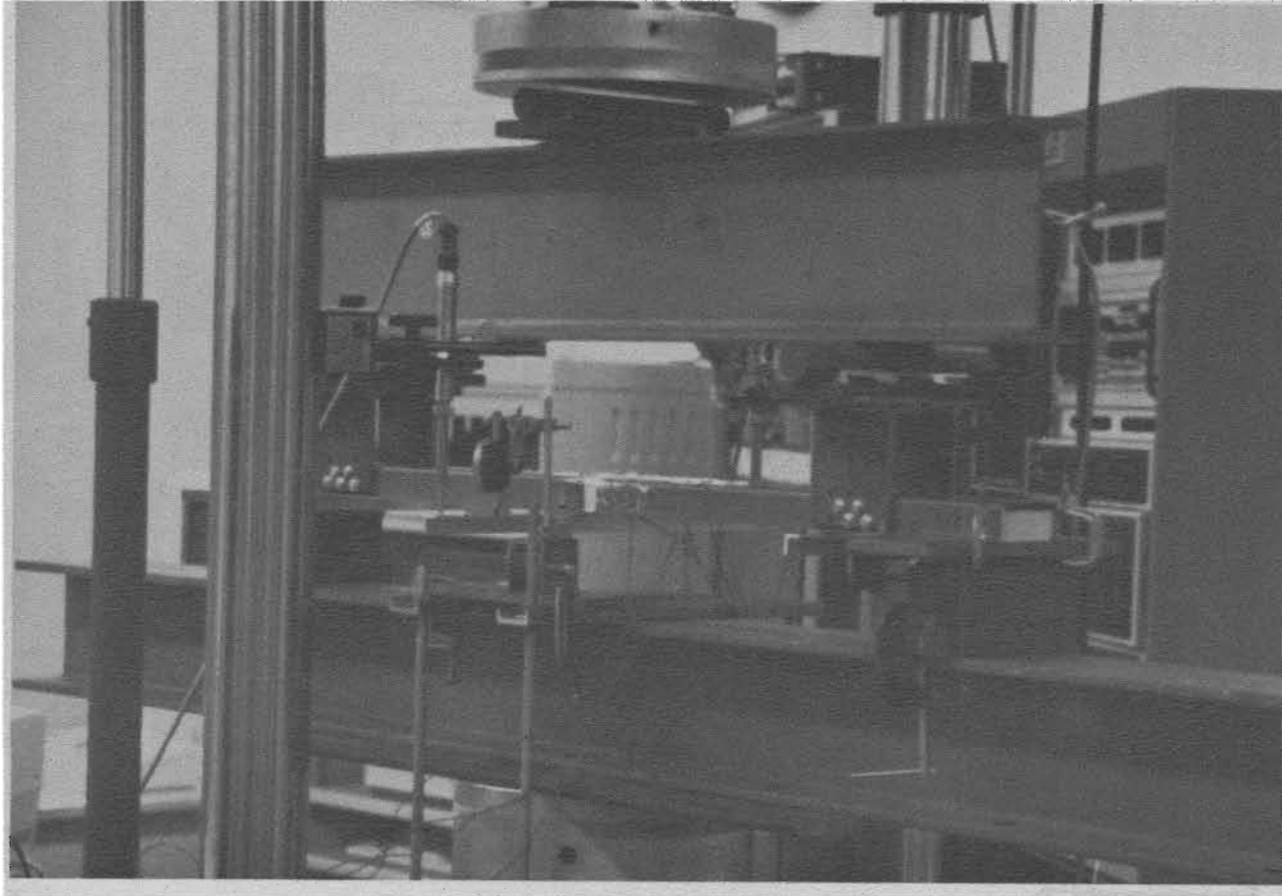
Photograph of Test Setup for Beams with a Stiffened Flange
